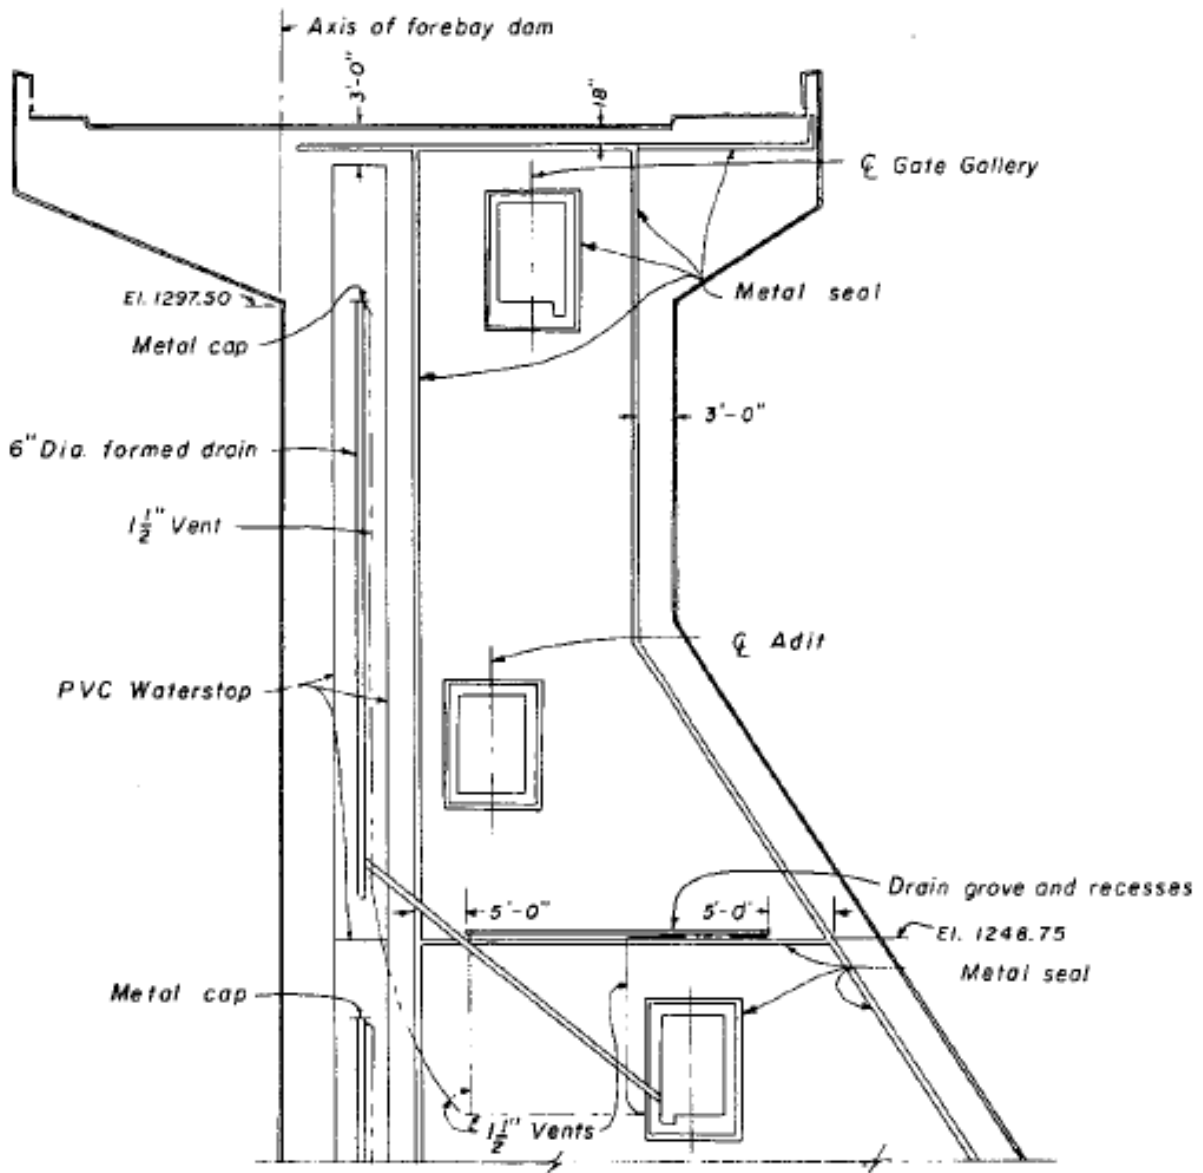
Metal seals inserted in the face of the first concrete placement and extended into the adjacent monolith, or second concrete placement to contain grout within area to be grouted.
